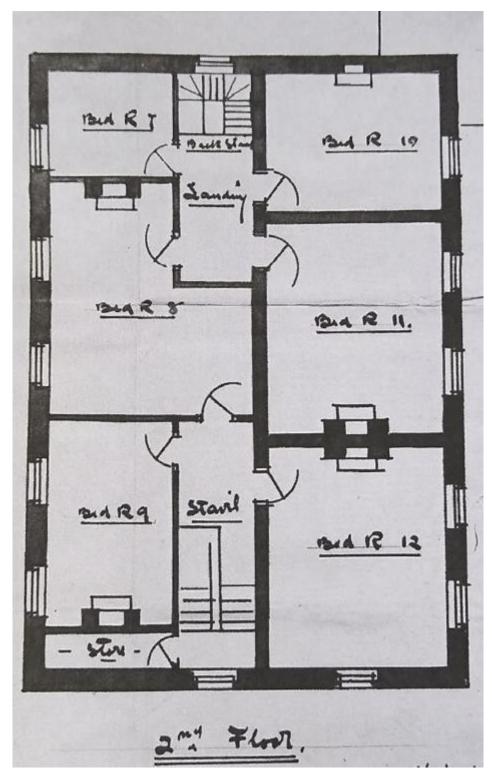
Second floor plan of Rumsey House (supplied by E. Harries)
